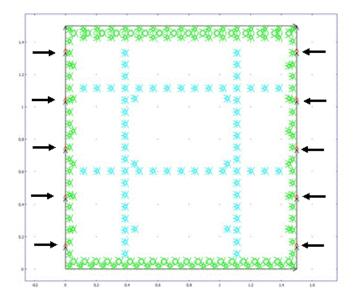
Typical model for vertical cross section with rebars indicated (here TA1 with 5 Ti* strips on each side face indicated by arrows)
